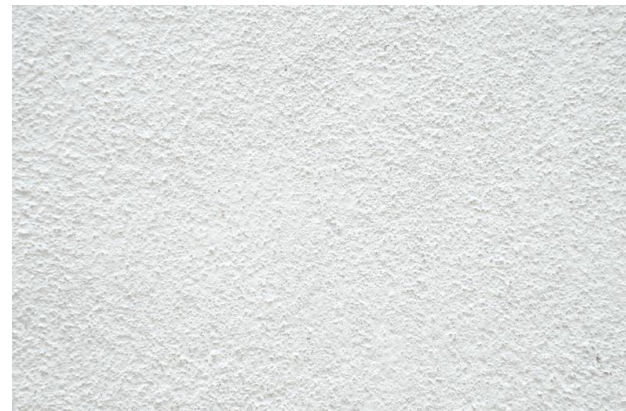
(b): Painted concrete wall (Riva,2017)
